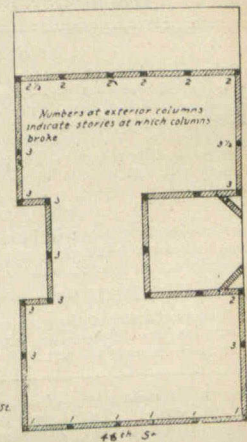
Floor Plan, showing the location of the cast iron columns in the outer walls, and indicating the stories at which these columns broke. The inside columns were practically all broken off at their bases.
